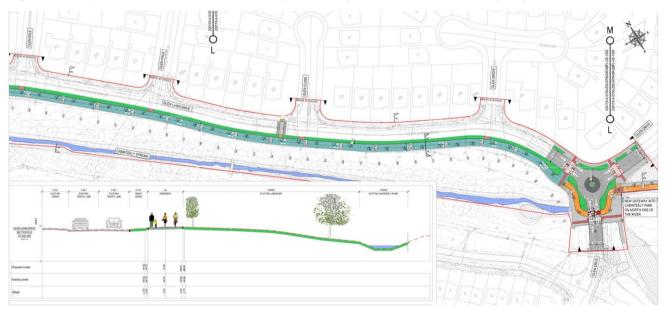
Proposed Section B(2) of Cabinteely Greenway (Source: DBFL Consulting Engineers)
